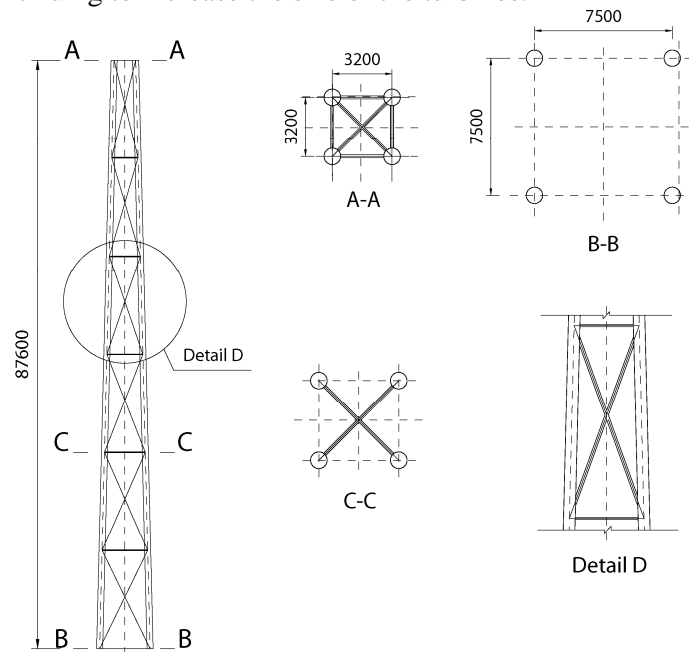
Layout of a truss tower. Units in millimeters. (Adapted from [23]).
